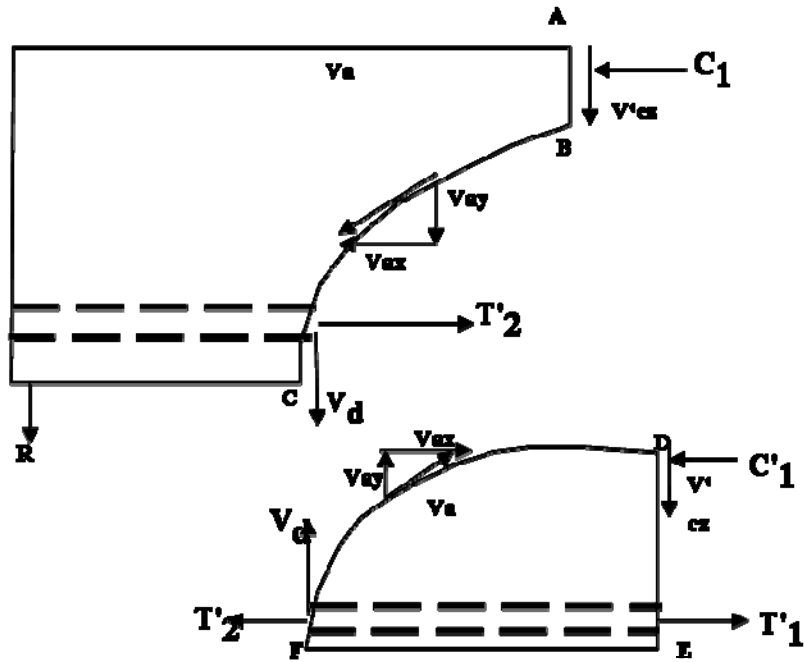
Internal forces in a cracked beam without stirrups.
